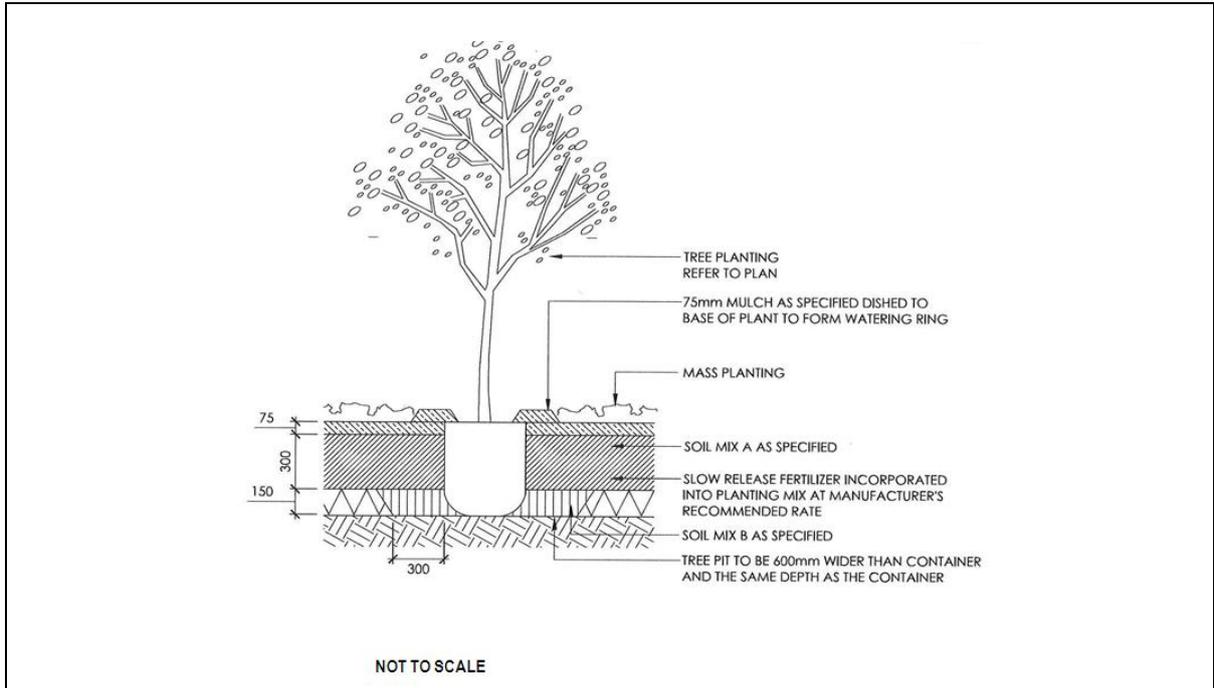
Semi-mature Tree in Tree in Mass Planting or Turf
